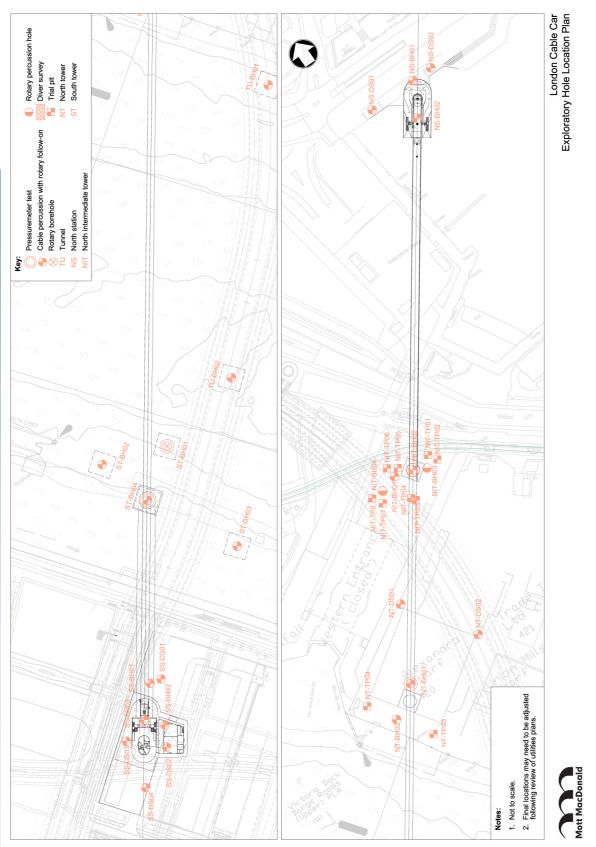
Detailed plan of the Cable Car route, London Boroughs of Newham and Greenwich (site code: CAC11).
